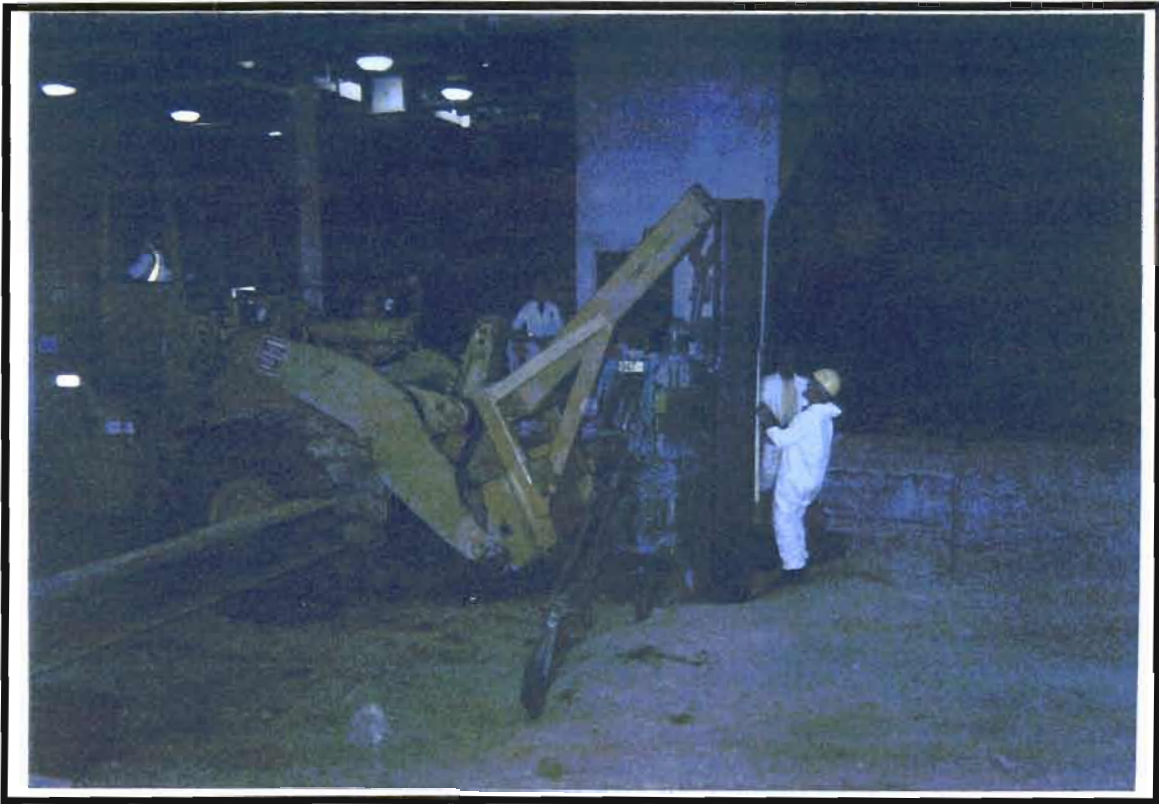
Installation of steel "H" piles with Vibro-Plate pile driving equipment.
